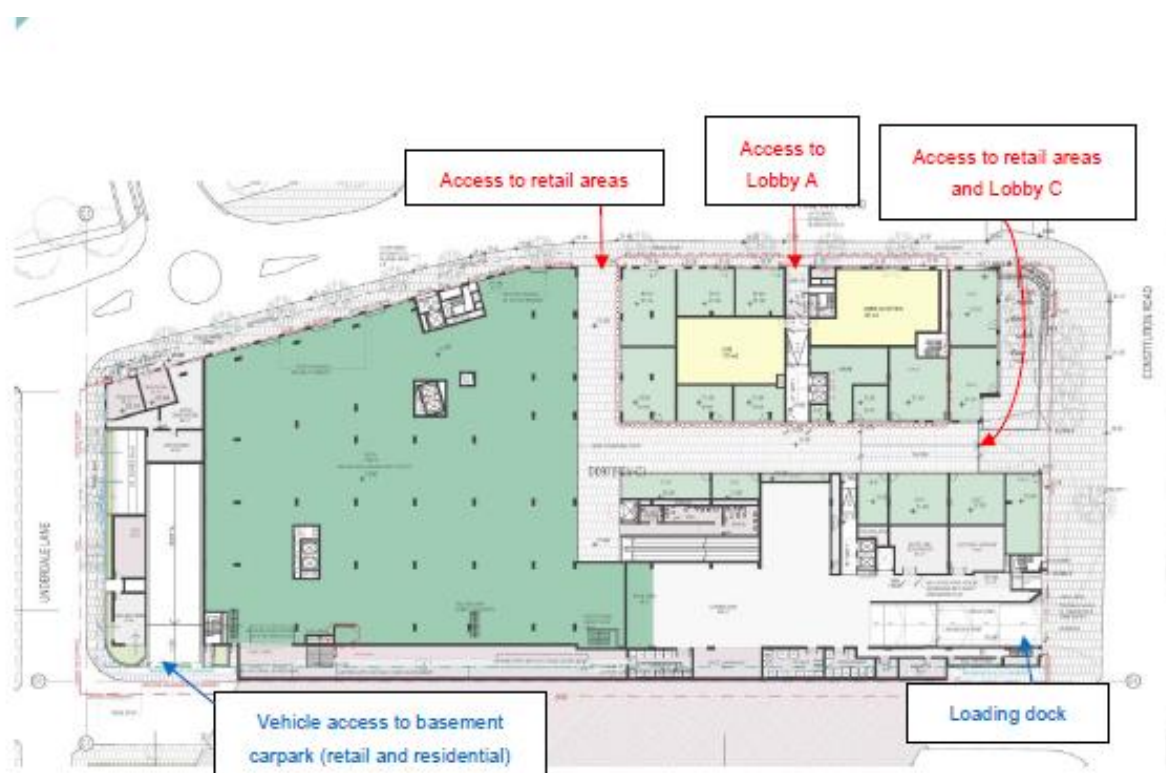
Ground floor plan with pedestrian and vehicle access indicated.
